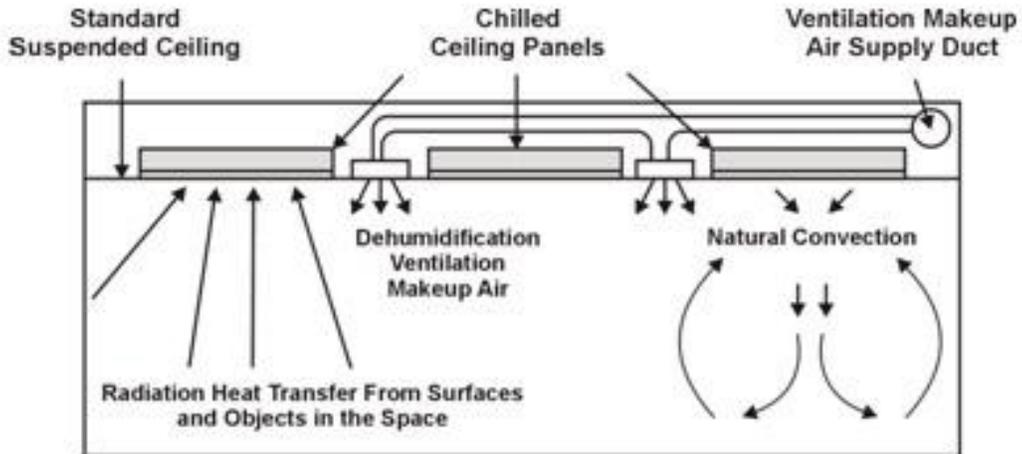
Schematic drawing of a radiant cooling ceiling system (Mounted panels)
